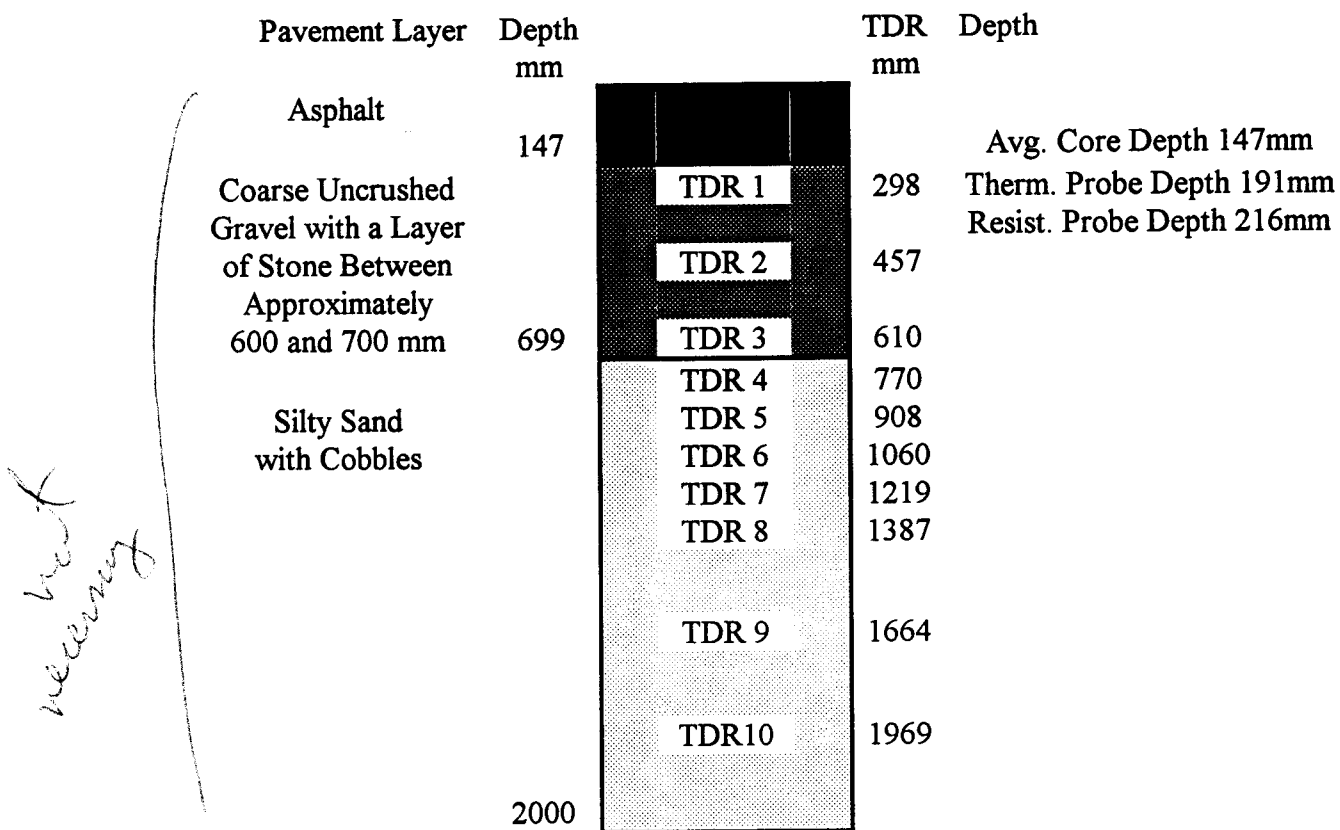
Profile of Pavement Structure and Probe Depths from Surface, Station 0-16
